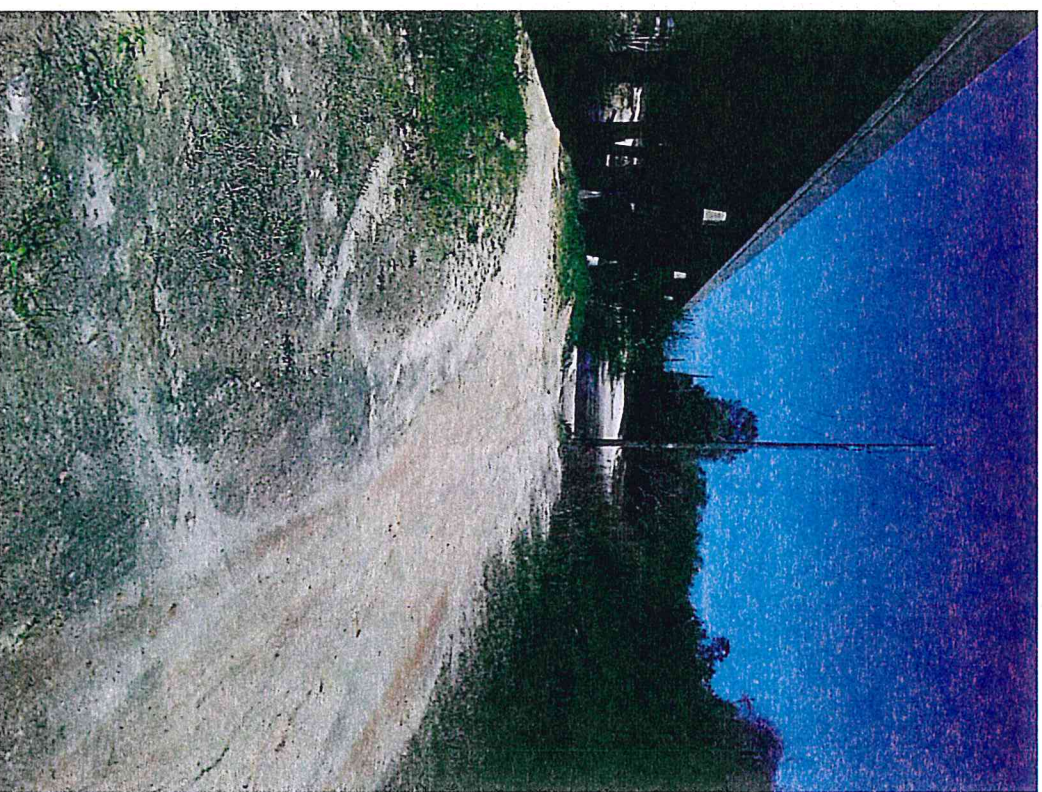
Unimproved road facing east at the west bank of the Tangipahoa River @ LA Hwy 440
